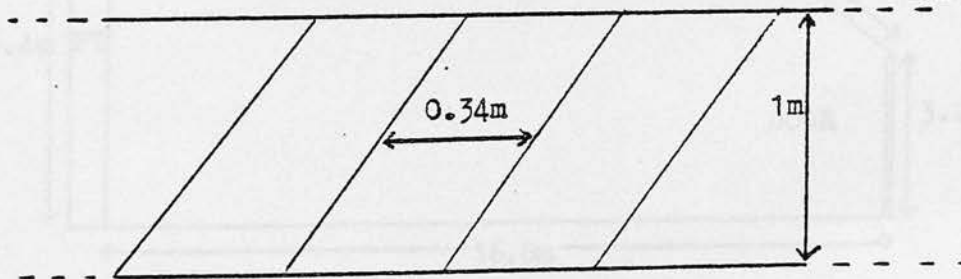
LAYOUT AND DIMENSIONS OF GROUP PEN E - "LONG BARN"
